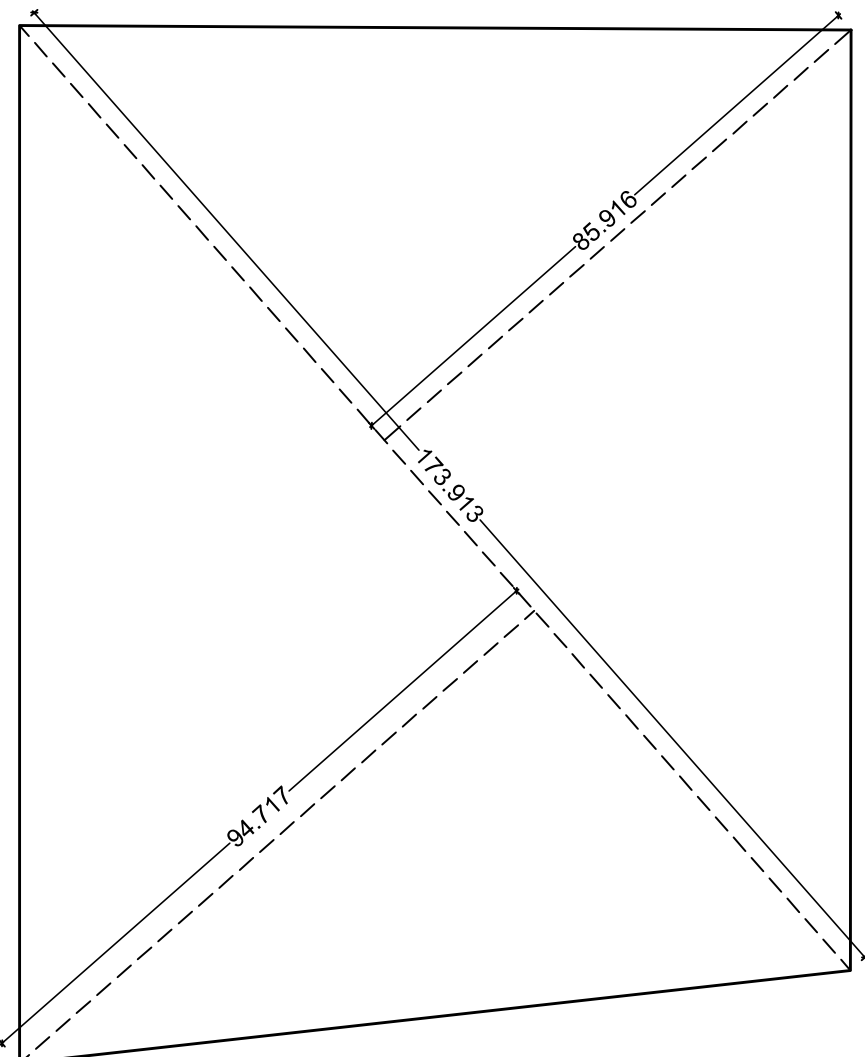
DETAILS OF LAYOUT/SUBDIVISION OF LAND
